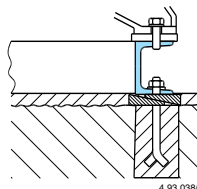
Foundation for unit mounted on welded, steel-section baseplate.
